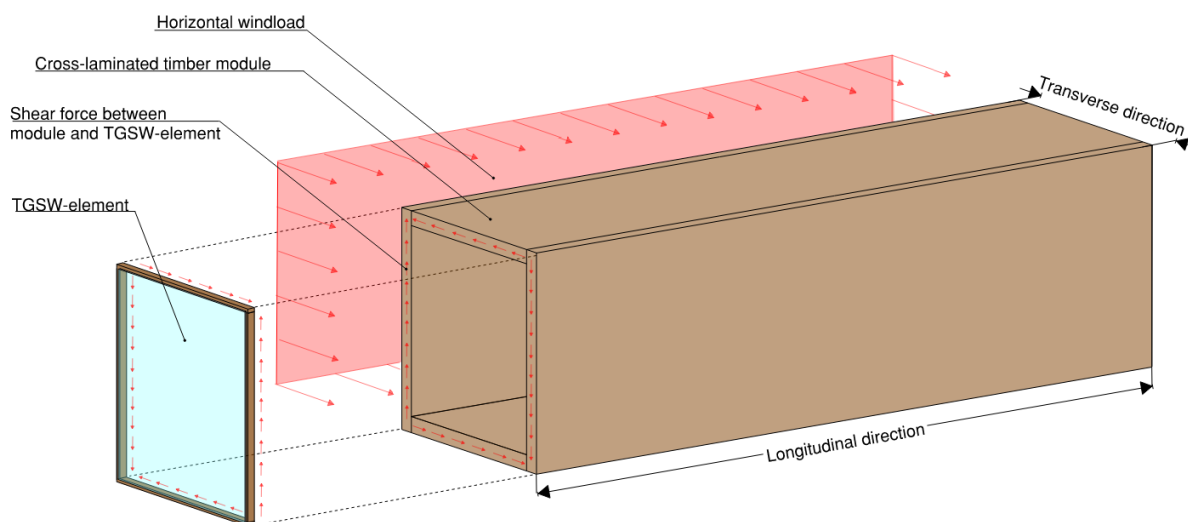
Timber-glass shear wall as stabilising element in a cross-laminated timber module
